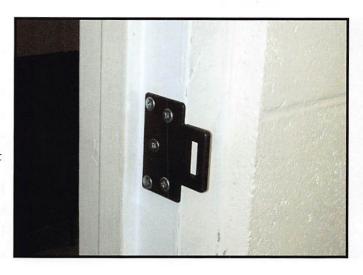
Photo I shows the door in question with a leverset installed, and the ominous "Authorized Personnel Only" sign. After a brief look at the door, frame, lock, templates and instructions, Mark and Hank decided that the installation would be fairly quick and easy. The mounting of the strike plate to the frame became the first order of business (Photo 2), and then the template came into play to mark for the actual lock mounting holes.
